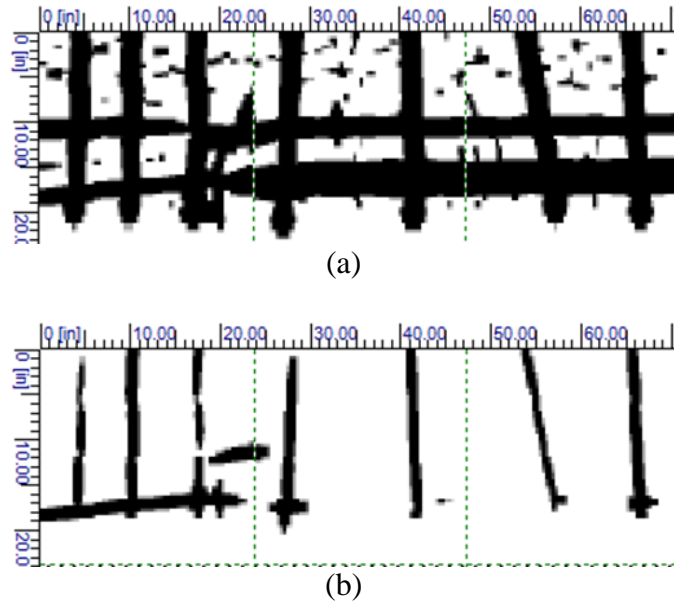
Blockscans on outside face of north exterior beam stem of Bridge 8761 at depth ranges of (a) 5 inches and (b) 2 inches.
